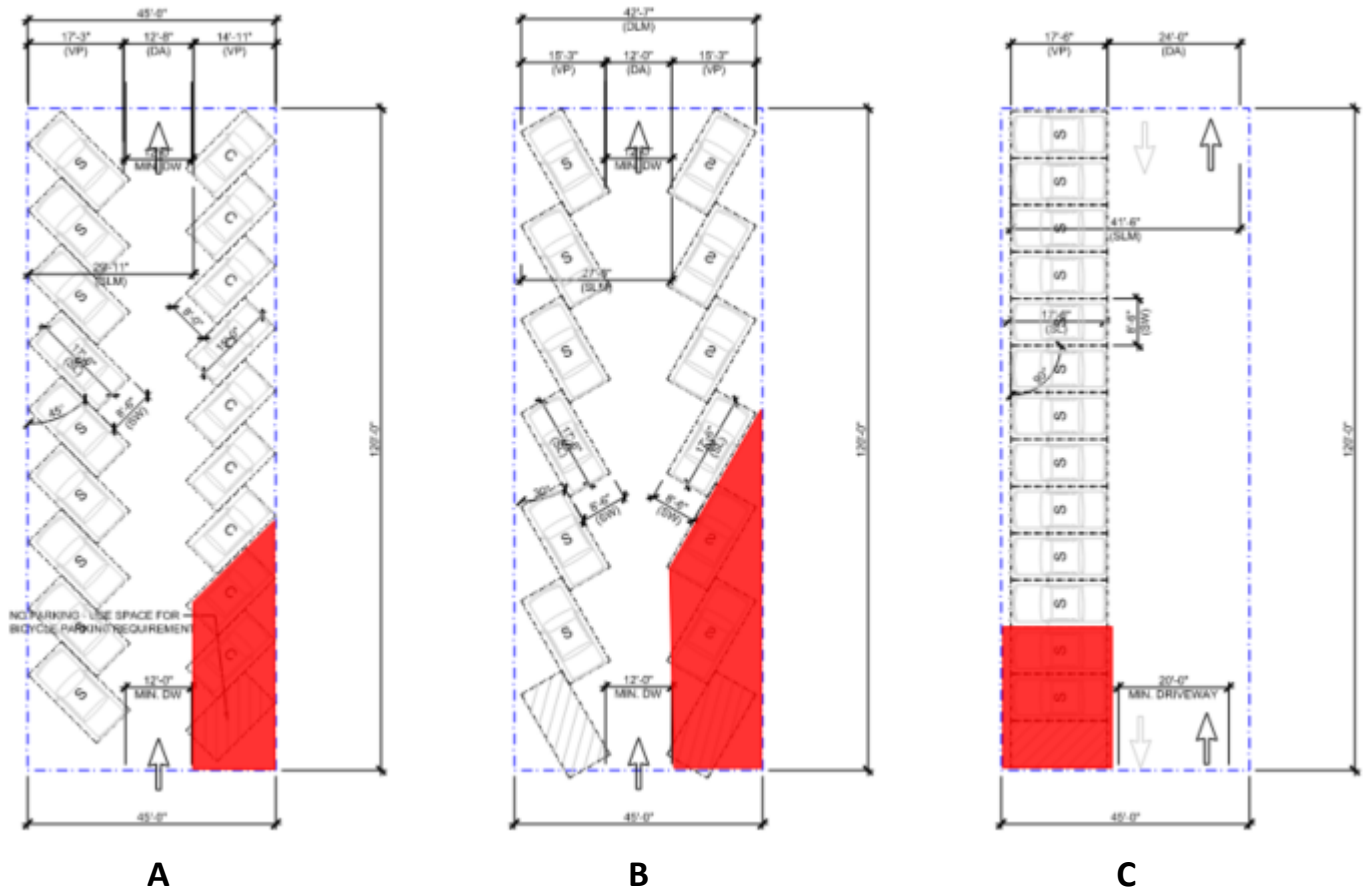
45-foot by 120-foot Site Parking Design Concepts (with Walker Parking Design Standards)
